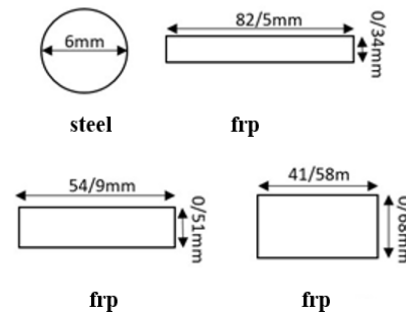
Schematic Cross-Sections of Modeled Stirrups (Not to Scale)
